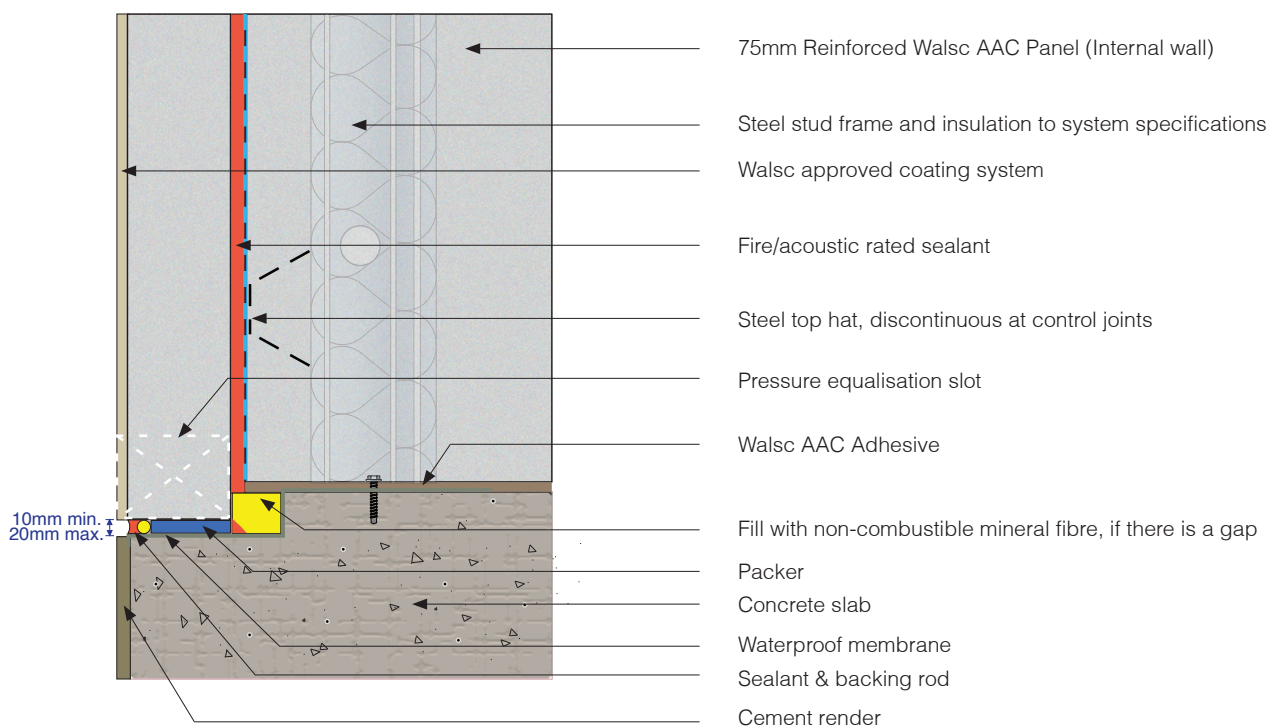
Inter-Tenancy / Corridor Wall to External Wall Junction Detail - Section AA
